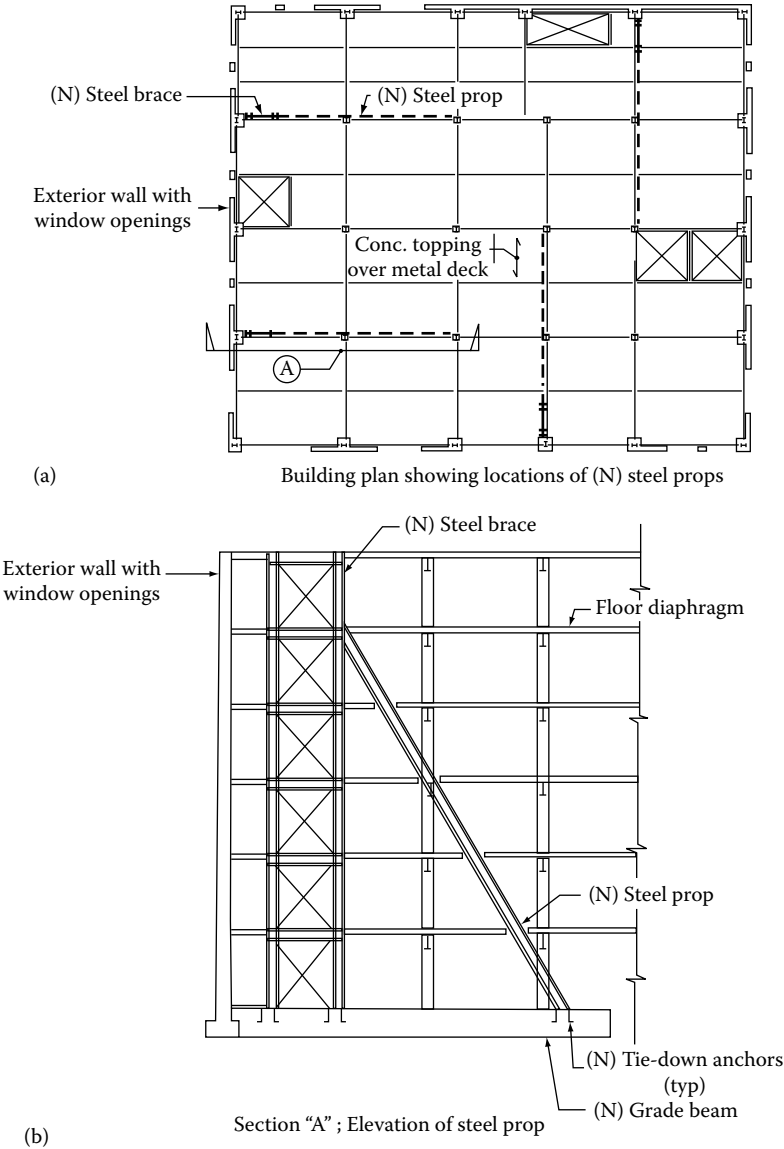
Braced structural steel buttresses to strengthen an existing reinforced concrete building.
